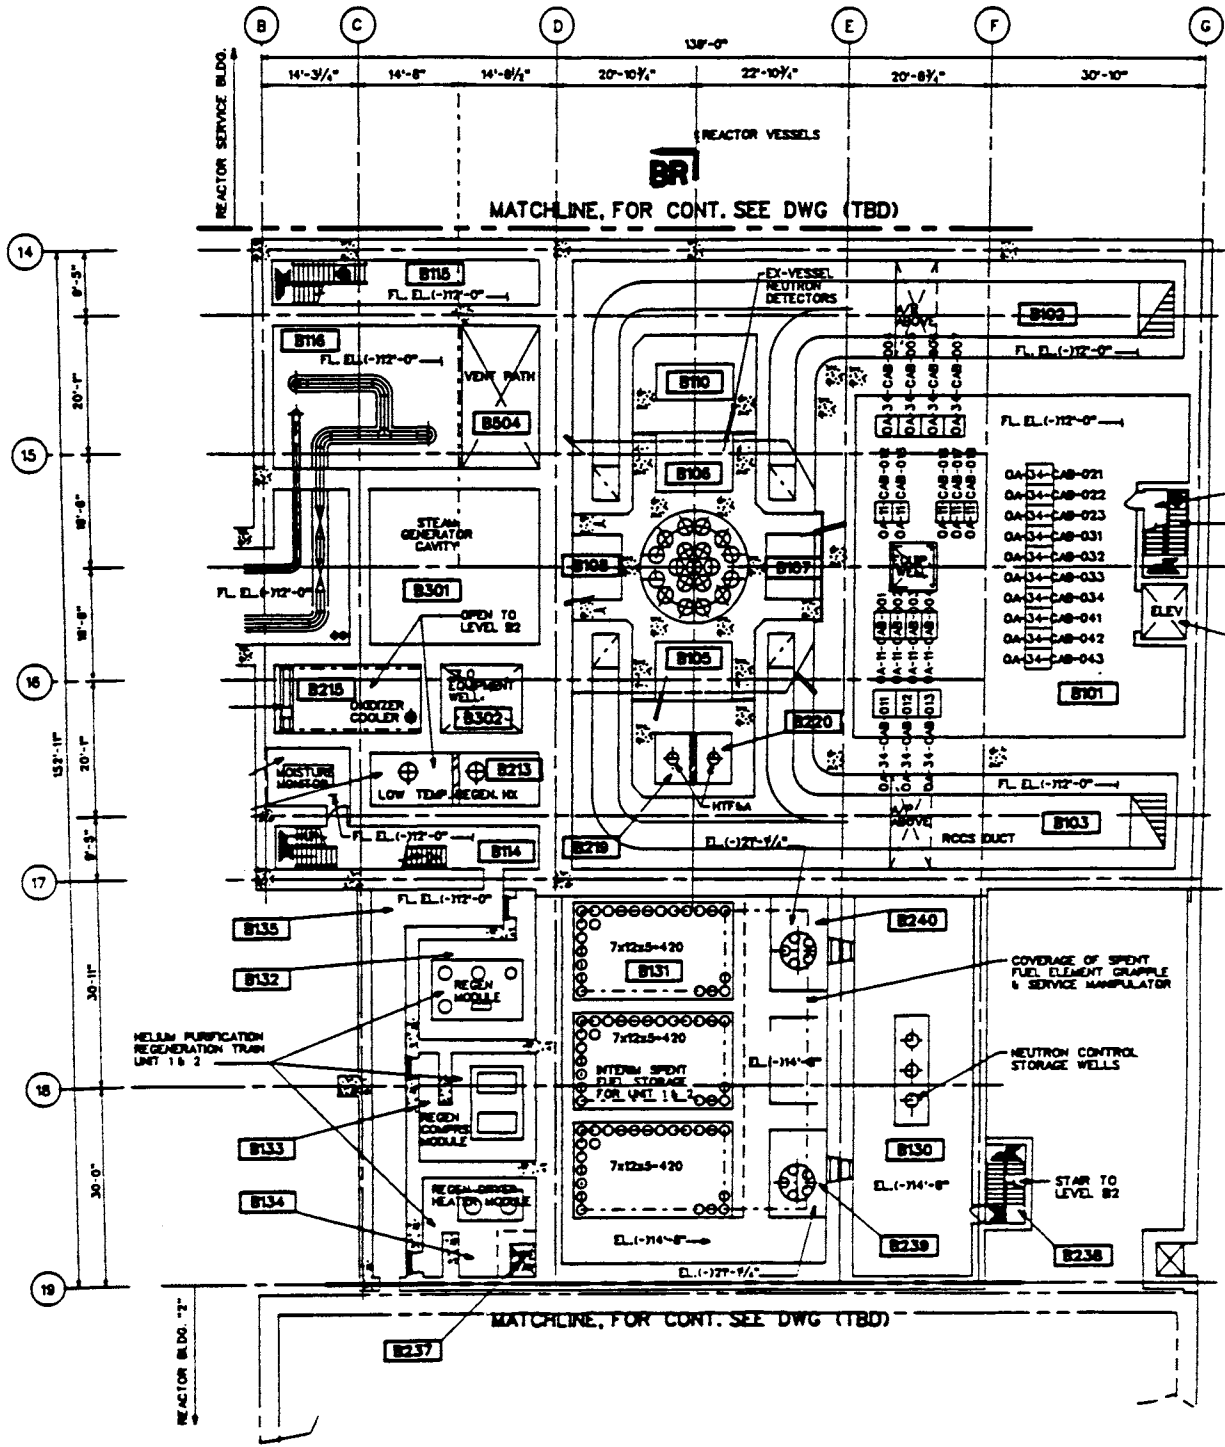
REACTOR BUILDING - PLAN AT LEVEL B1
